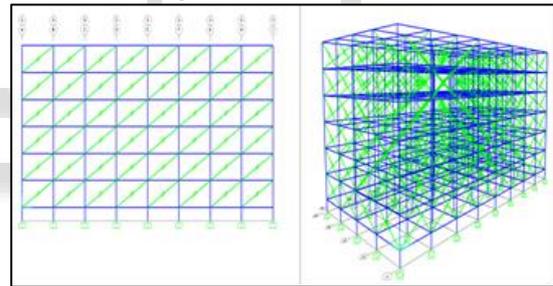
Elevation & 3D View of G+5 storey infill wall frame building
